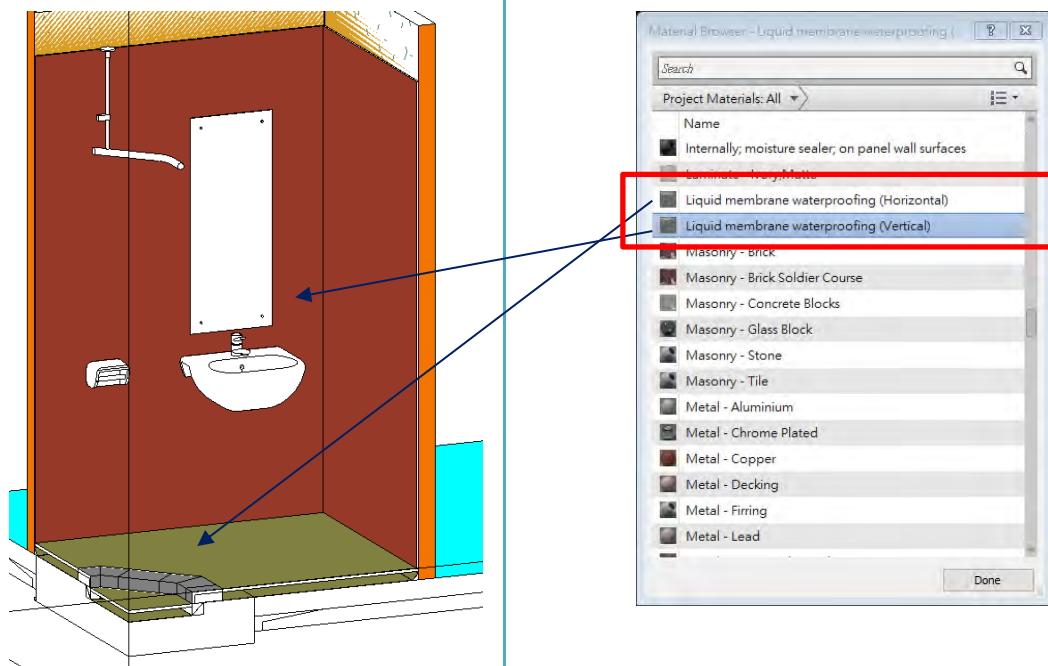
3D View of Area Applying “Paint” for Waterproofing Layer
